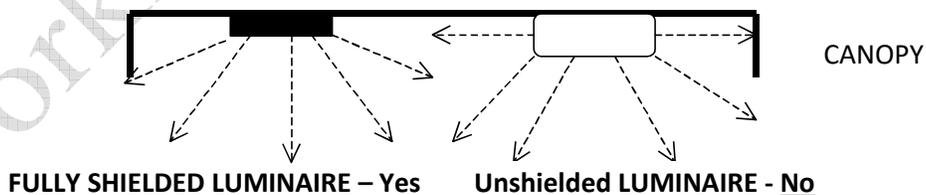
Building canopies, overhangs, roof eaves and similar types of construction shall not be considered as the means for providing the light cutoff. The cutoff characteristics shall be achieved by the luminaire itself.
